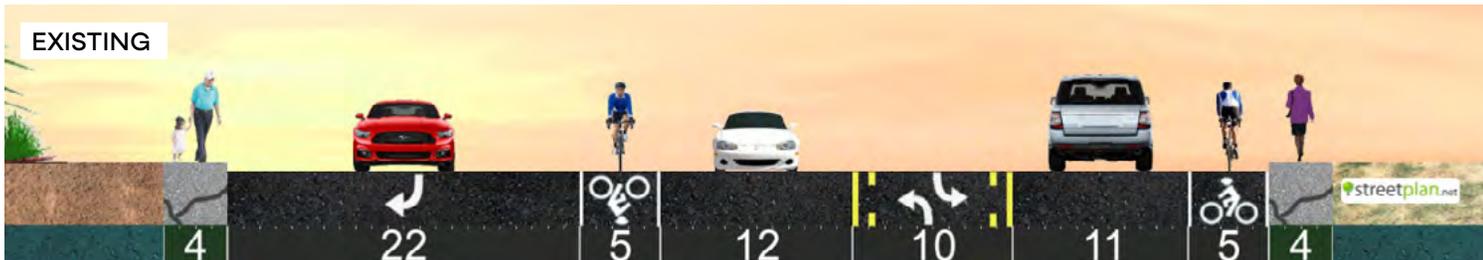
Existing Conditions: LOVR between Pecho Road and Monarch Grove Elementary School, looking east
